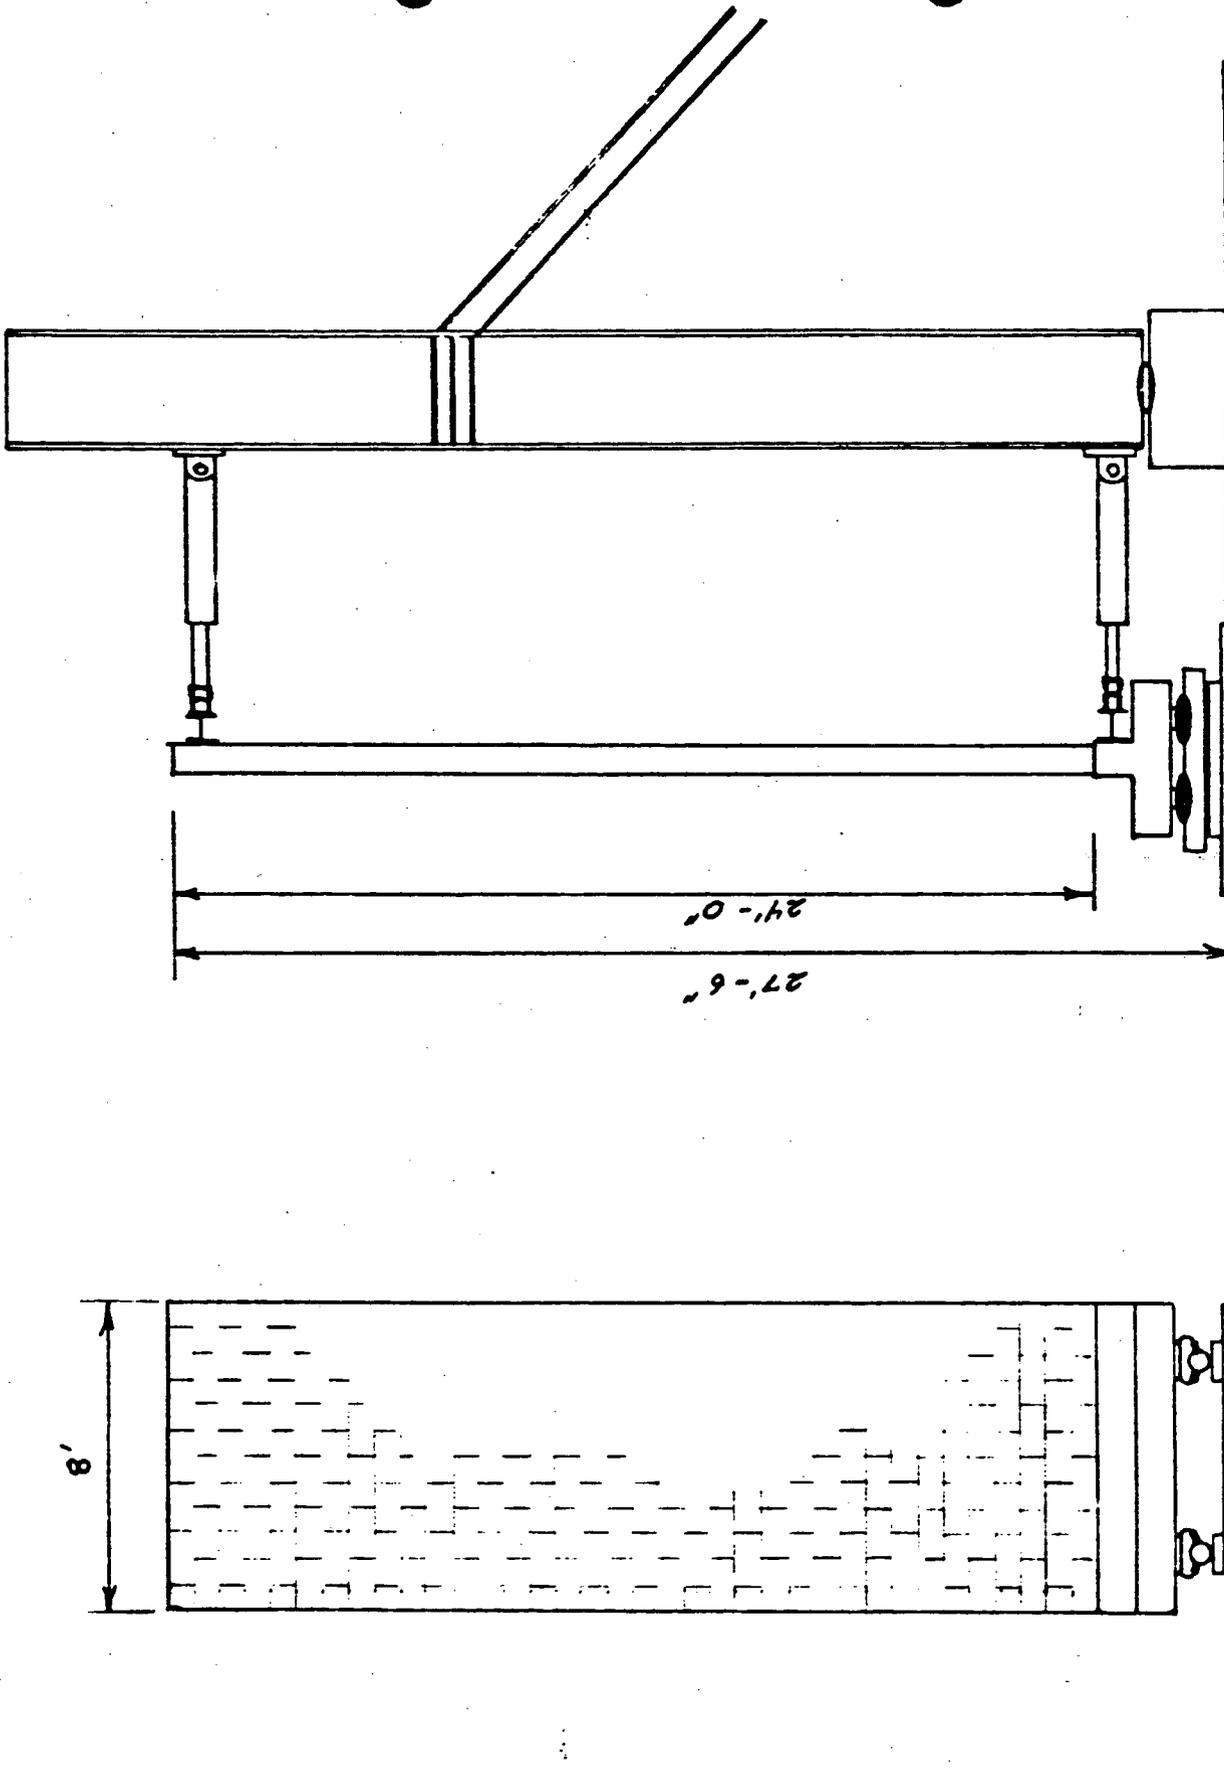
PROTOTYPE WALL SPECIMEN
